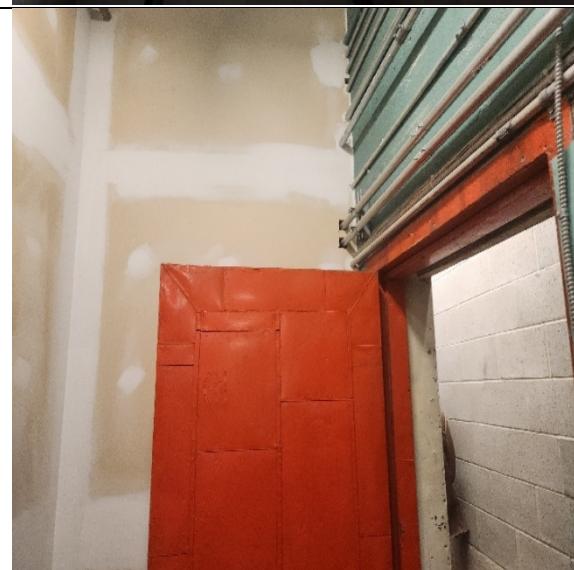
View of the asbestos-containing mechanical systems insulation in the form of parging cement observed above the drywall ceiling in the Elevator Room 012 at the Subject Location.
